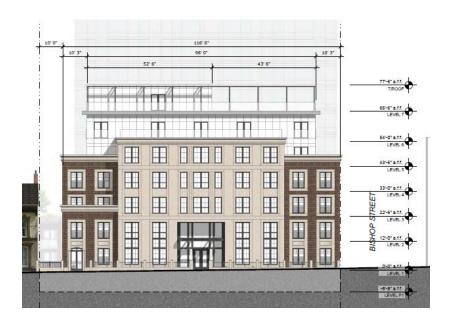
West Elevation of the Proposed Development -View from Hollis St.
